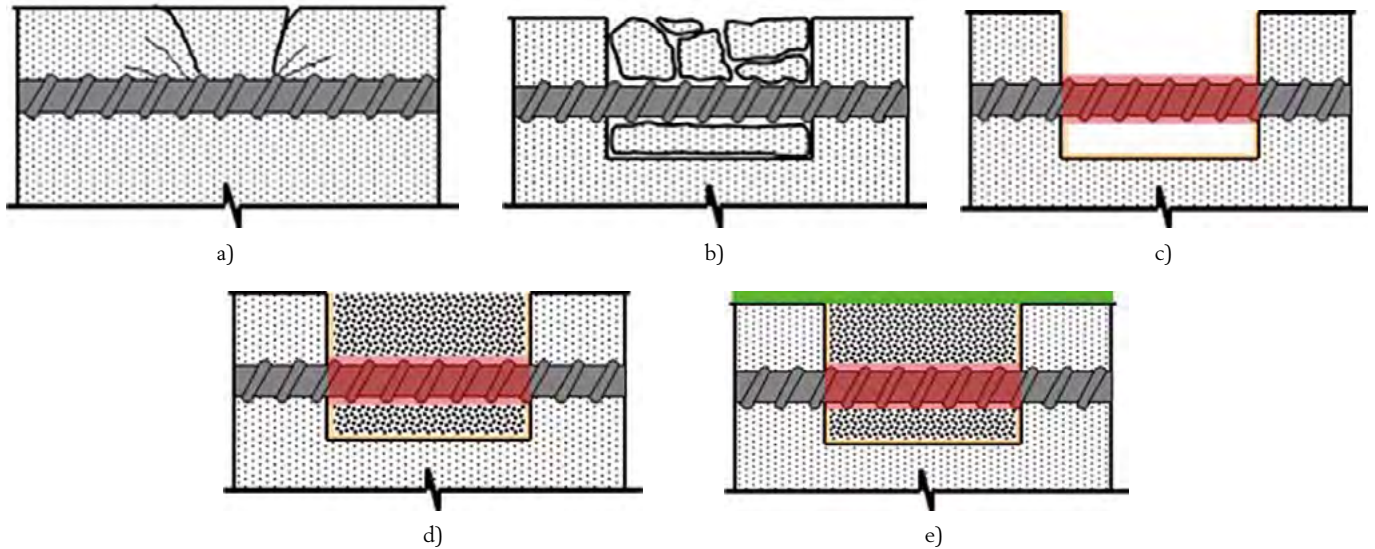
Stages in patch repair: a) inspection to detect damaged areas; b) removal of damaged concrete; c) reinforcement de-rusting and primer application; d) geometric restoration, and e) replacement of concrete cover.
